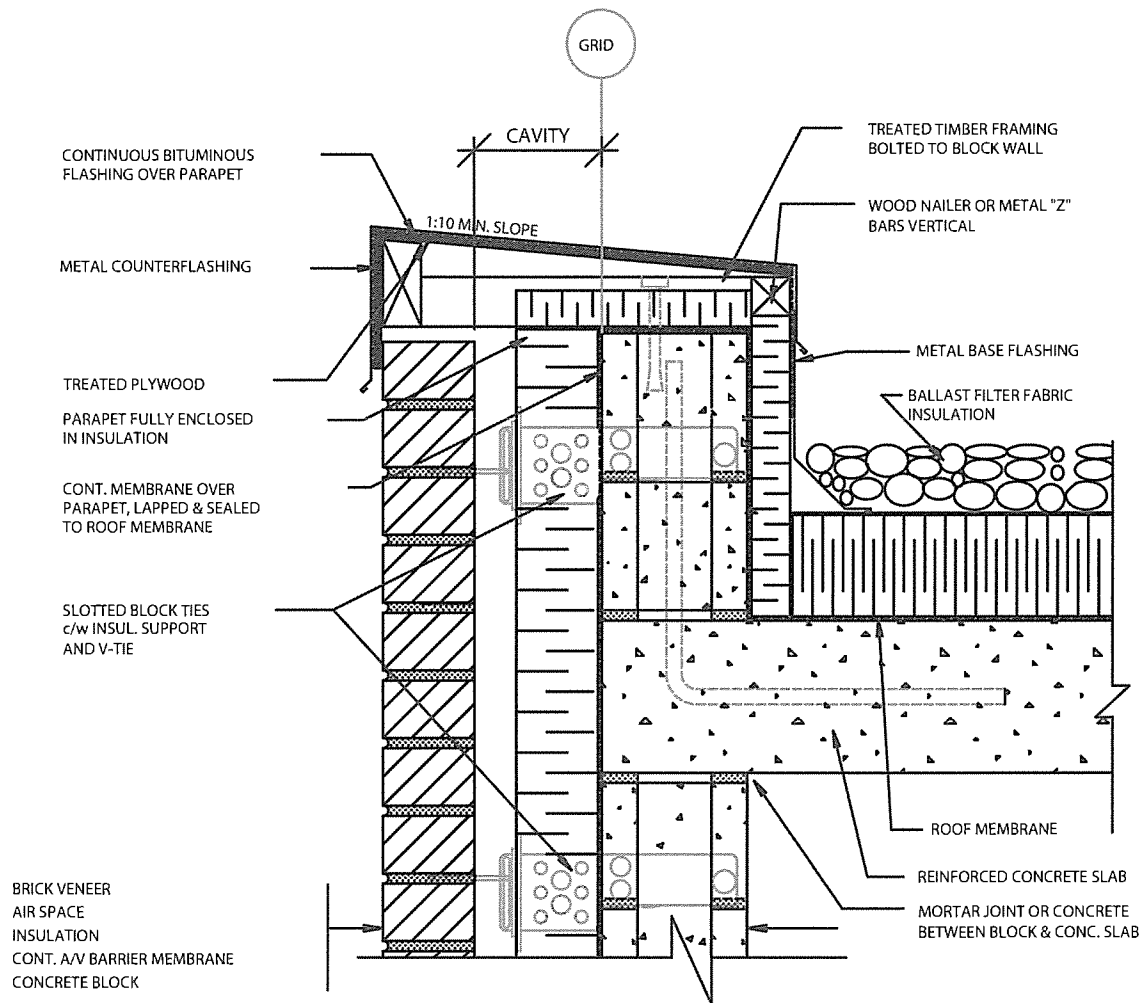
BRICK VENEER/CONCRETE BLOCK-DETAIL OF LOW PARAPET W/
